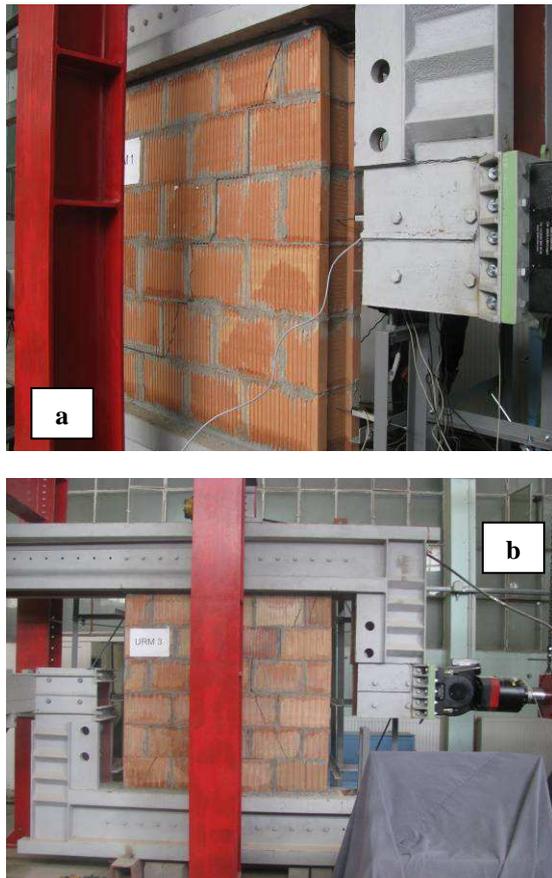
Failure mode for URM specimens (a. URM1, b. URM3)
